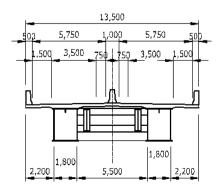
Cross Section of Interchange Ramp Bridge and overpass of Existing Road
